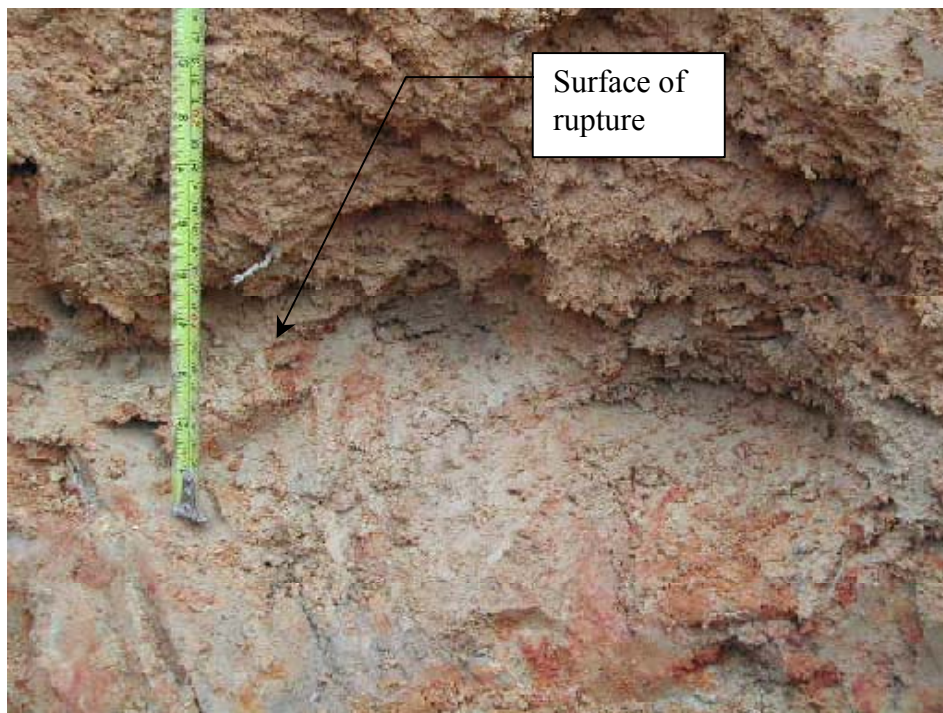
Surface of Rupture at Interface between Colluvium and H/MDT in Trial Pit No. TP3
